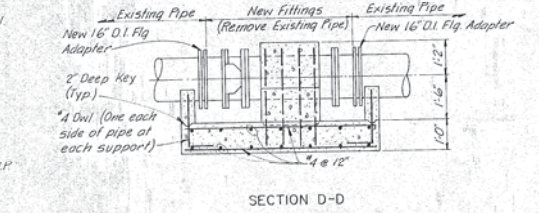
DETAILS OF NORTH AND SOUTH CONNECTIONS TO EXISTING WATER MAIN
